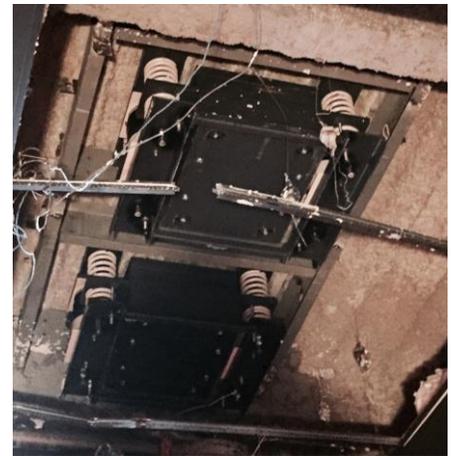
Two TMDs installed underneath one of the bays of the floor system
